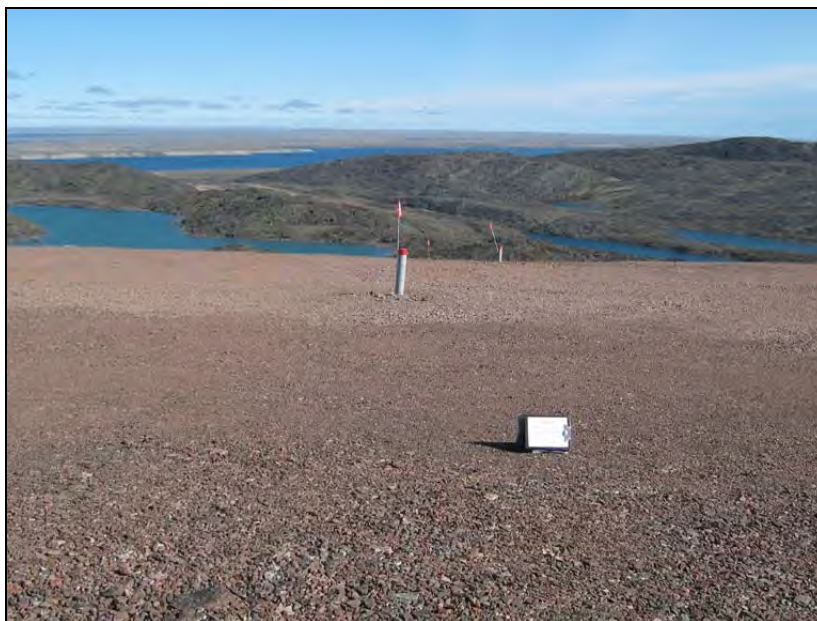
Panoramic photo facing southeast towards west slope of Upper Site Landfill. ↑
